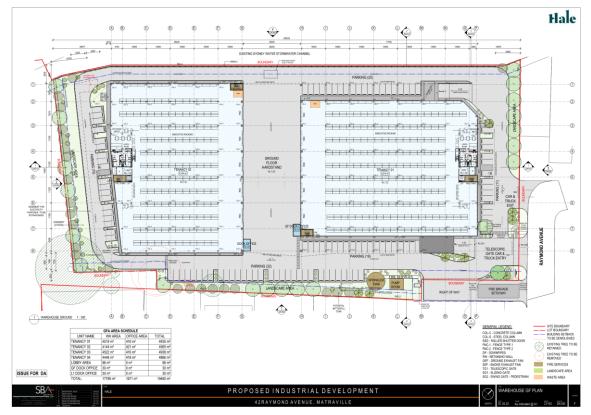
Proposed Development (Ground Level) – Concept Layout Plan
